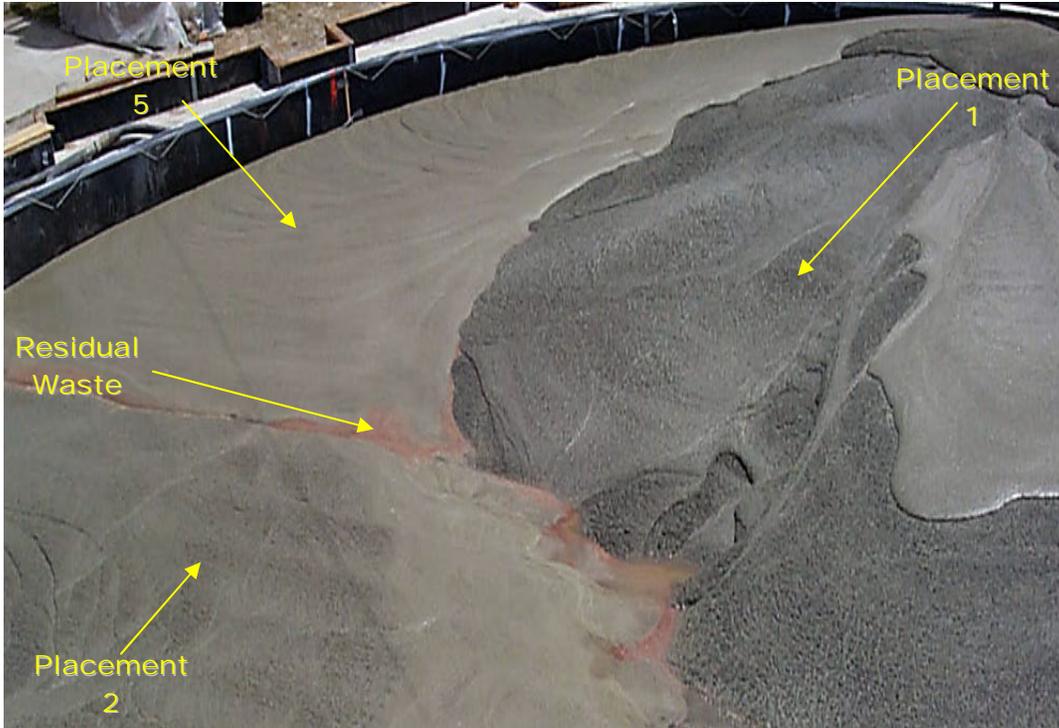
A-3. Mounding of grout placements and vertical mixing.
